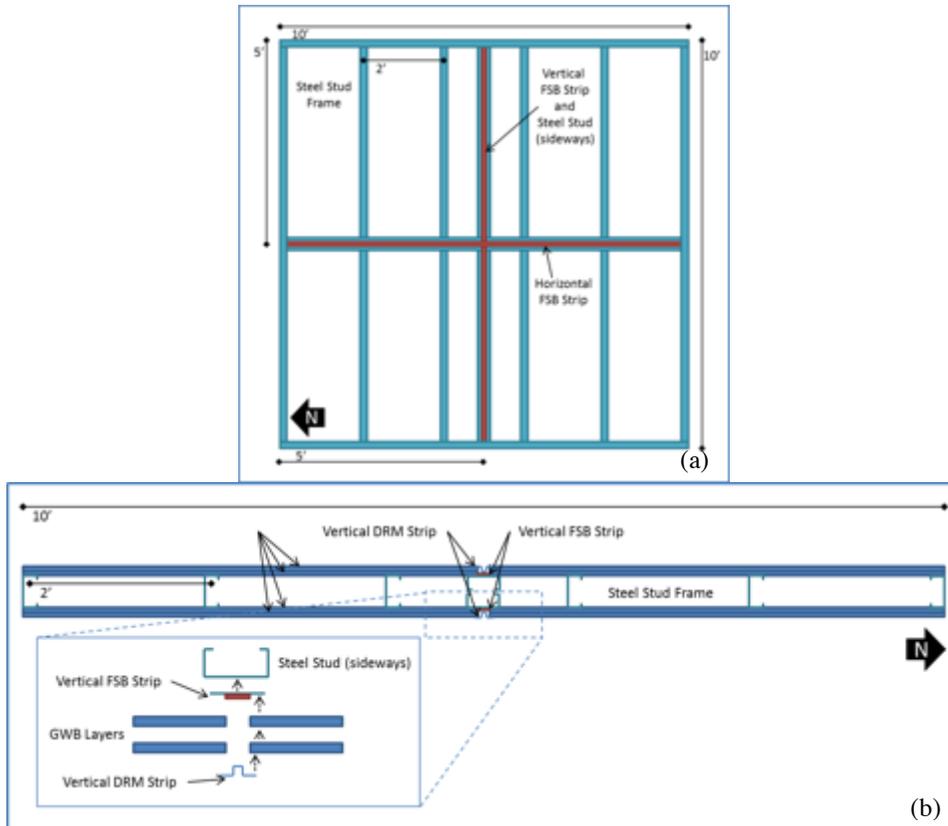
Schematic of wall assembly showing (a) frame, and (b) top-view cross section.
